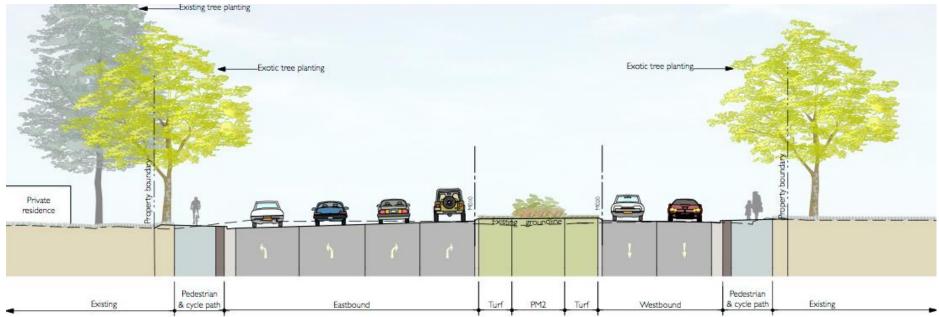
Typical cross-section near the intersection of Memorial Avenue and Burns Road leading to Windsor Road
